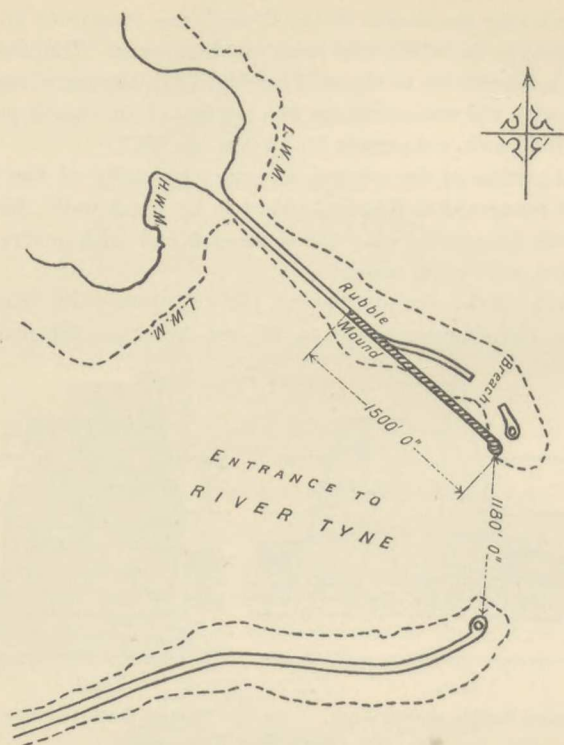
Breakwater Piers at the mouth of the River Tyne, showing Reconstruction of North Pier.
